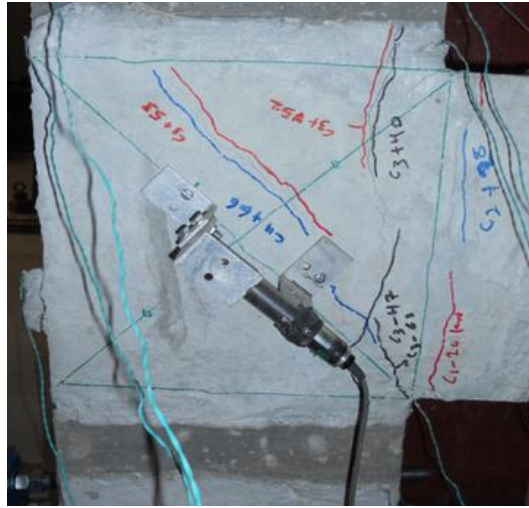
Spilling Of Concrete in Joint Region for Specimen J-BU-12
